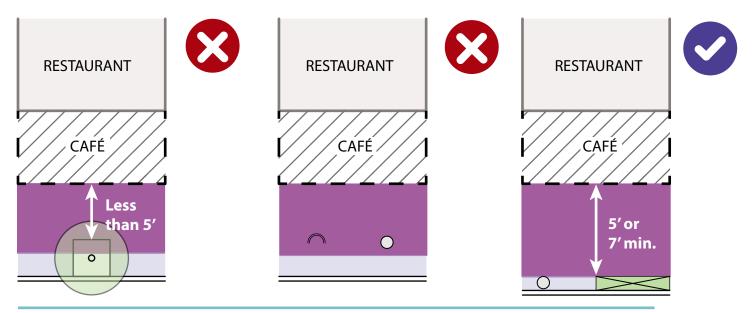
Tree grates/planters and other obstructions such as bike racks and/or street signs are not allowed within the sidewalk café's designated Pedestrain Access Route (PAR). The PAR must maintain a minimum 5' width or 7' width throughout, dependent on the adjacent road type.
